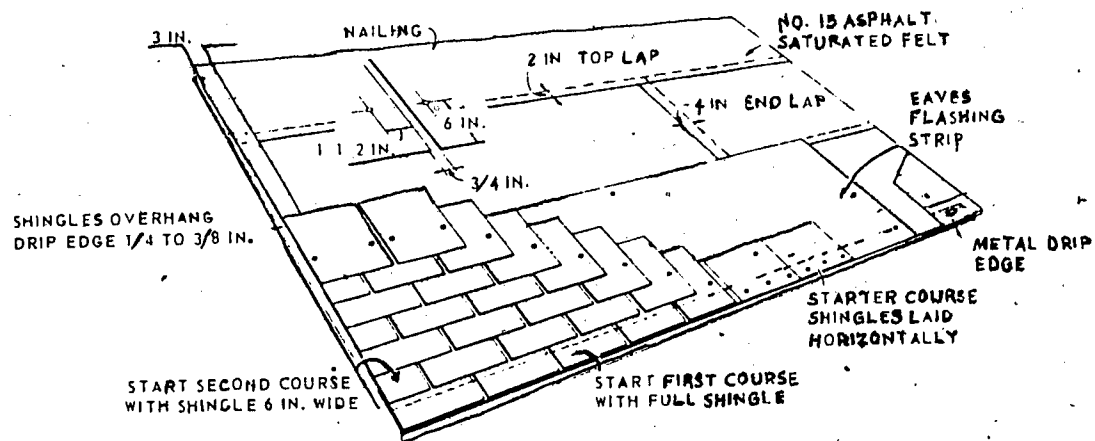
Application of giant individual asphalt shingles by the American method.
